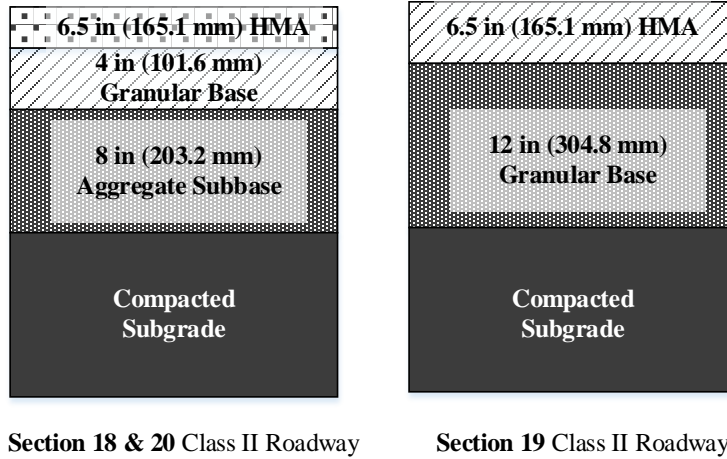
Layer configurations of sections 18, 19, and 20 in Ogle County, Illinois.
